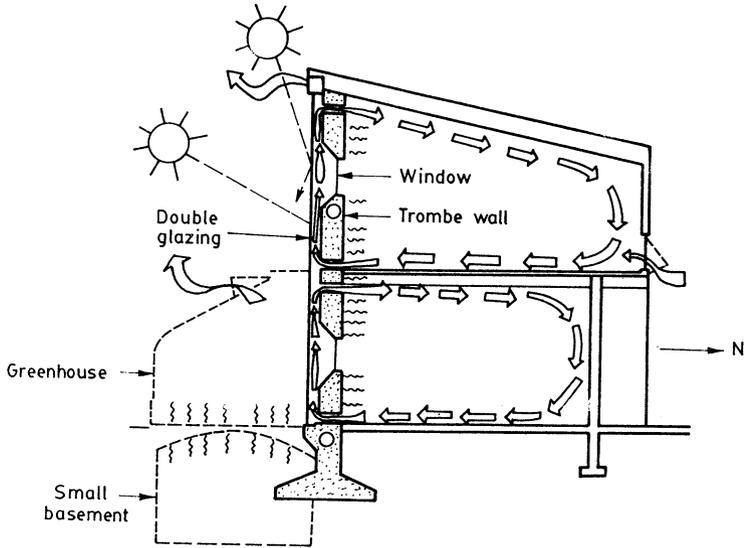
CROSS-SECTION (LOOKING WEST) KELBOUGH HOUSE (From SANDIA[29])
